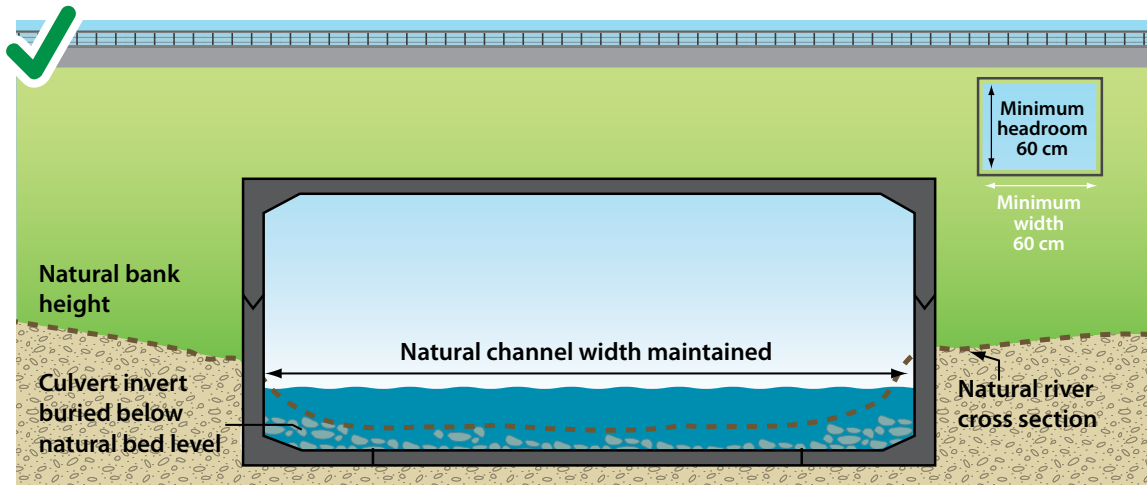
Good practice, mammal passage provided by constructing an additional tunnel.
